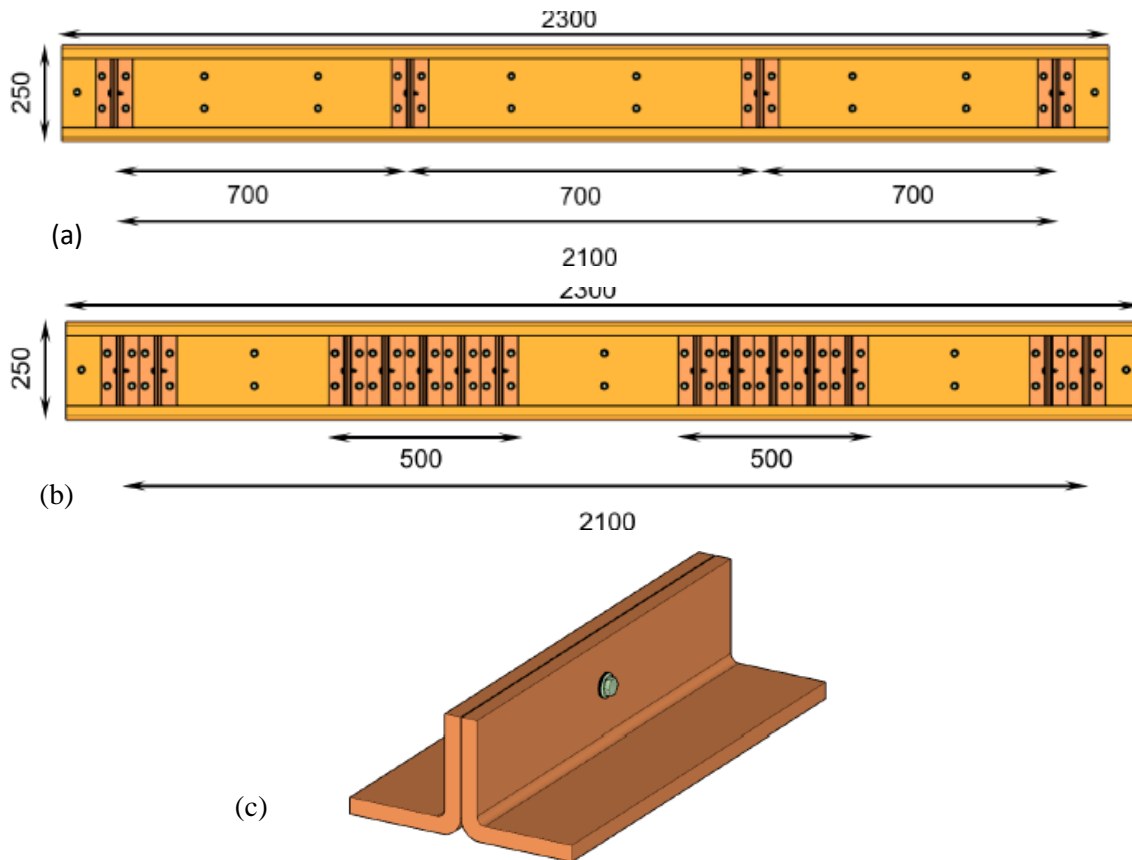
Details of the specimens adopted; (a), (b): repartition of stiffeners along the length of the I-beams, (c): built-up stiffener adopted [93].
